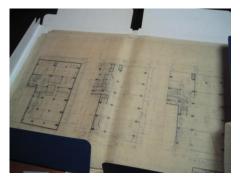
and 2 Archives at Raymond's Architectural Design Office, Tokyo.
